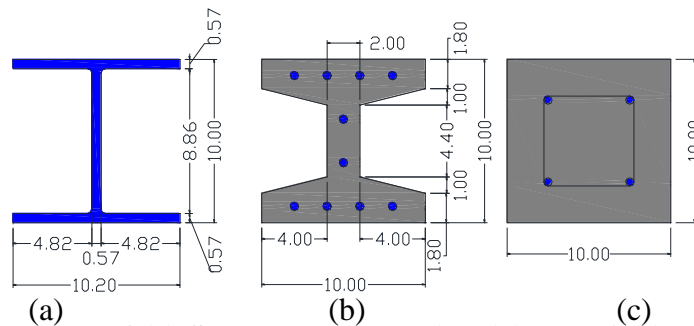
Cross-section of (a) Steel HP 10 x 57 Pile; (b) UHPC Pile; and (c) 10 x 10-in. Normal Concrete Pile (all dimensions in inches)
